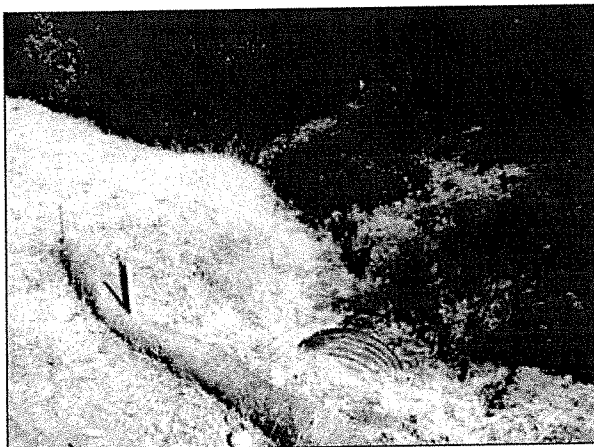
View north of dry streambed and culvert just south of the residential housing and north of the tributary.
